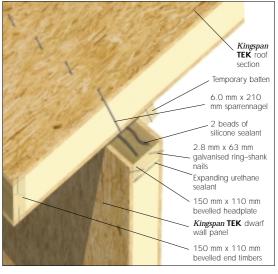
WALL/ROOF INTERSECTION SHOWING ANGLED HEADPLATE DETAIL
